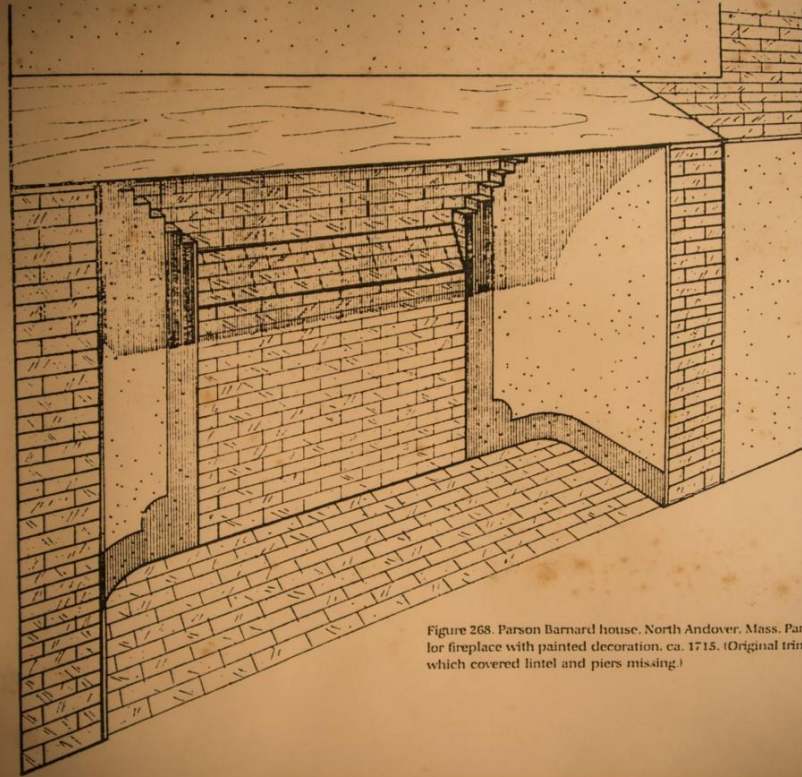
Parson Barnard house, North Andover, Mass. Parlor fireplace with painted decoration, ca. 1715. (Original trim which covered lintel and piers missing.)
